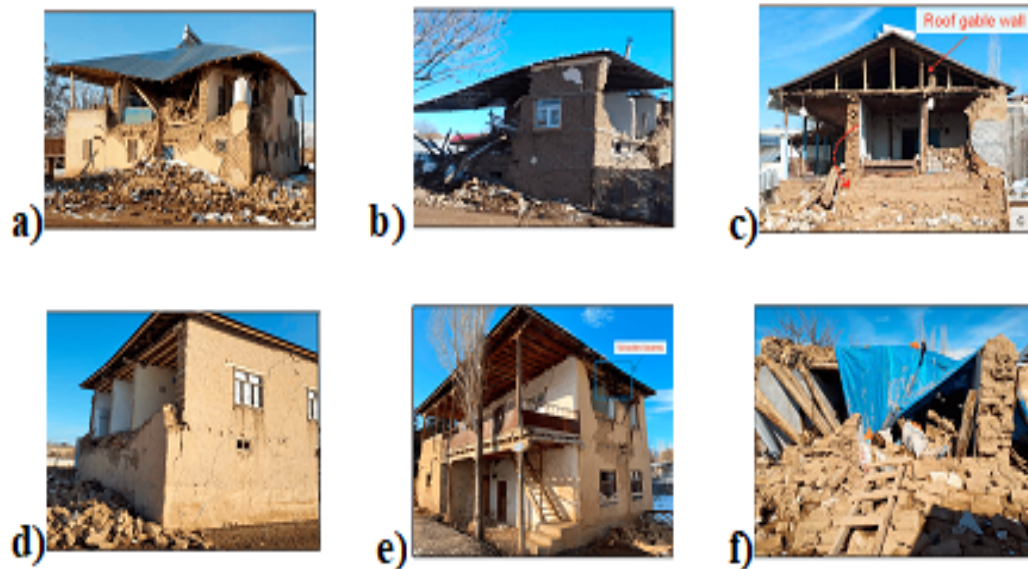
Structural damage in adobe buildings with different wall materials a) and b) adobe-rubble stone, c) adobe-briquette with roof failure, d) adobe-rubble stone, e) adobe-brick damage, f) adobe-rubble stone collapse. [49].
